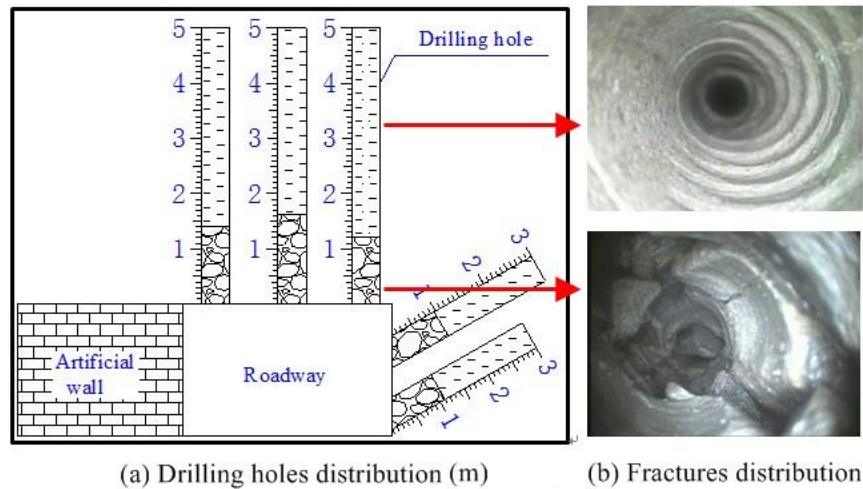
Results of the drilling imaging in RGSG roof and right sidewall
